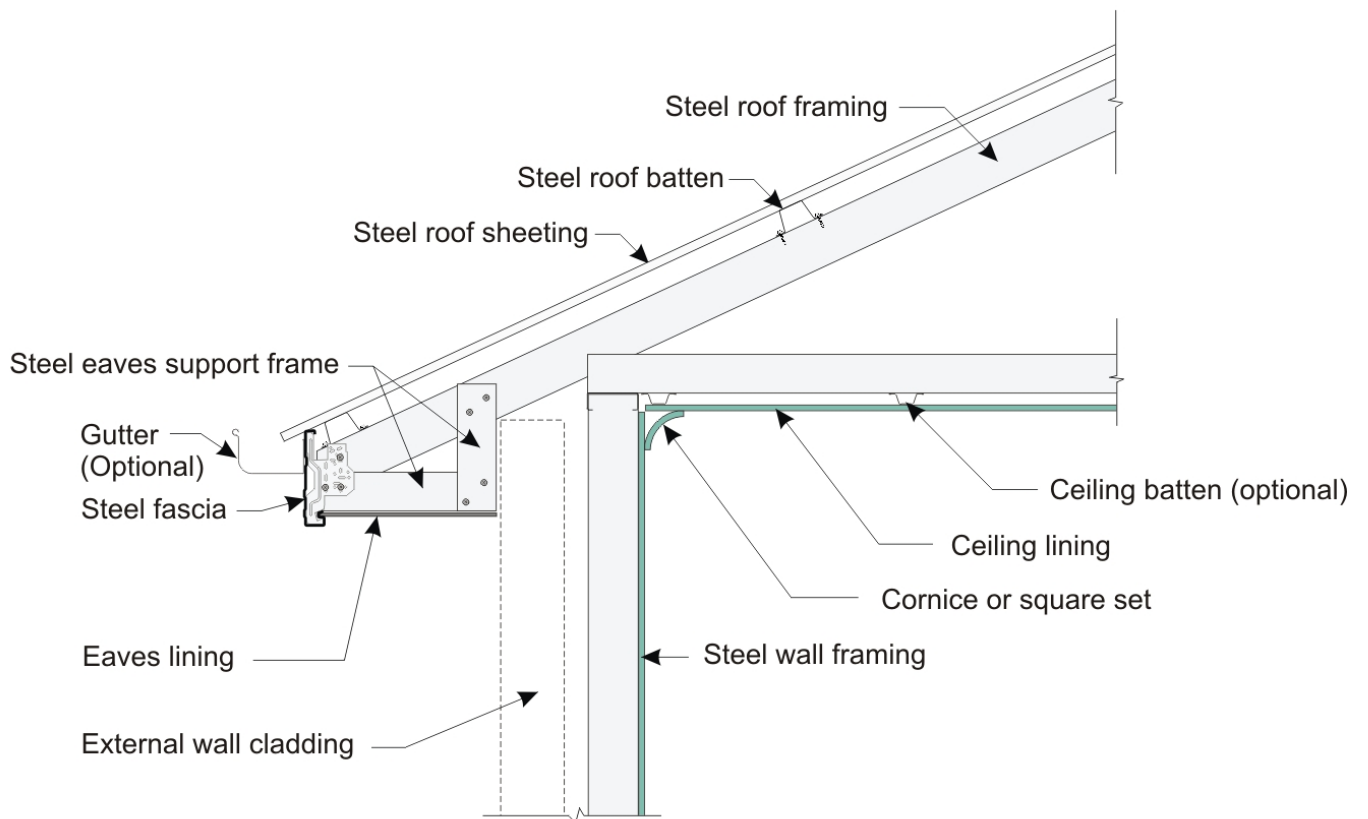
Typical steel roof details BAL-12.5, BAL-19, BAL-29 and BAL-40
